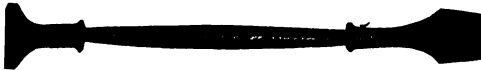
COMMON TYPE OF DOUBLE-END HAND TAMP
